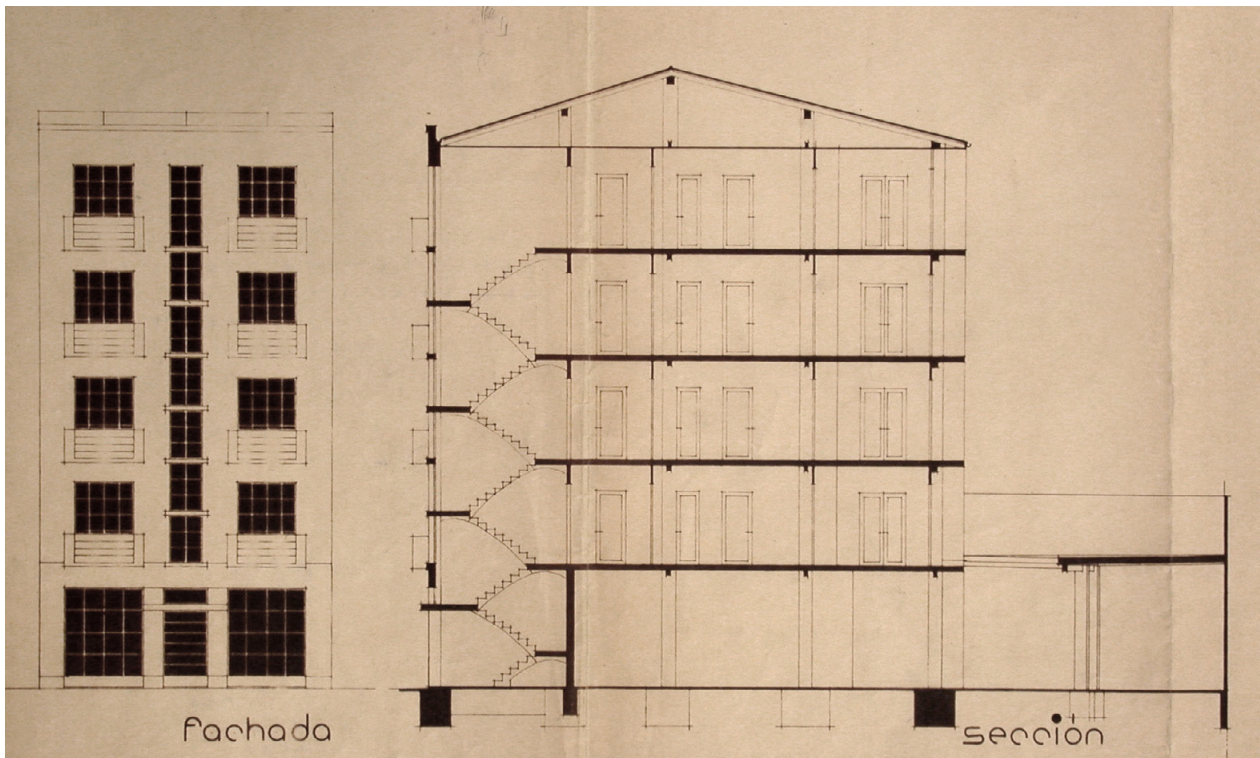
Vicente Ros building, 1934. Elevation plan and longitudinal section. Source: Historical archive Municipality of Valencia (AHMV).
